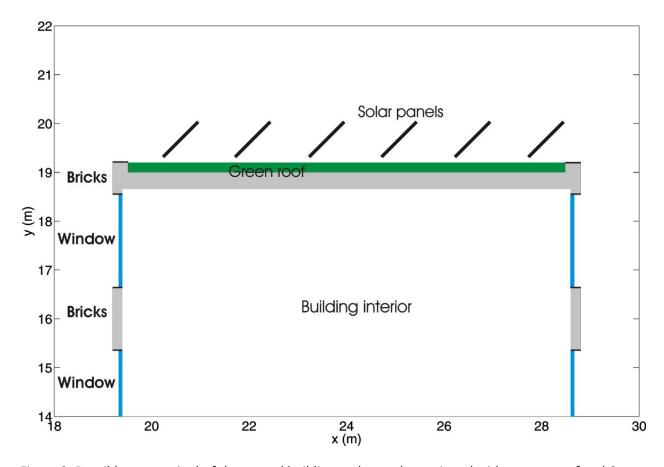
Detail (cross-section) of the central building under study, equipped with a green roof and 6 rows of solar panels under an angle of 45°.
